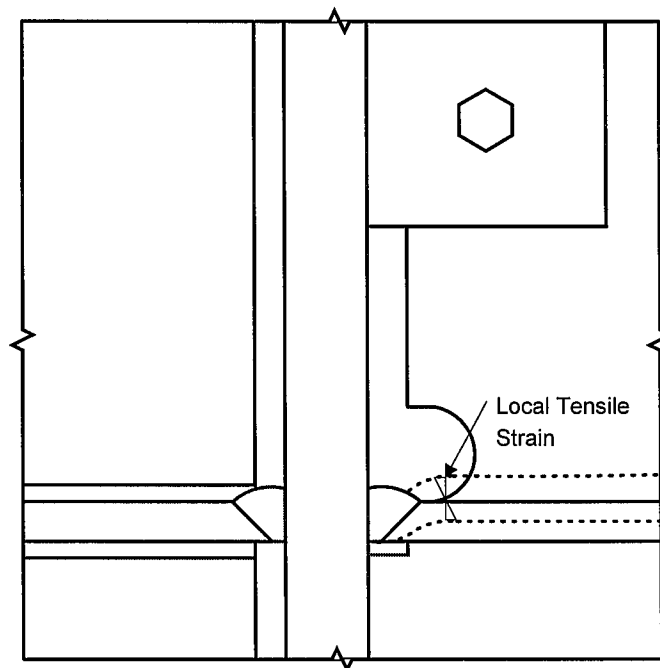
Elevation IV: Girder Flange Localized Shear Condition (Positive Girder Bending)
